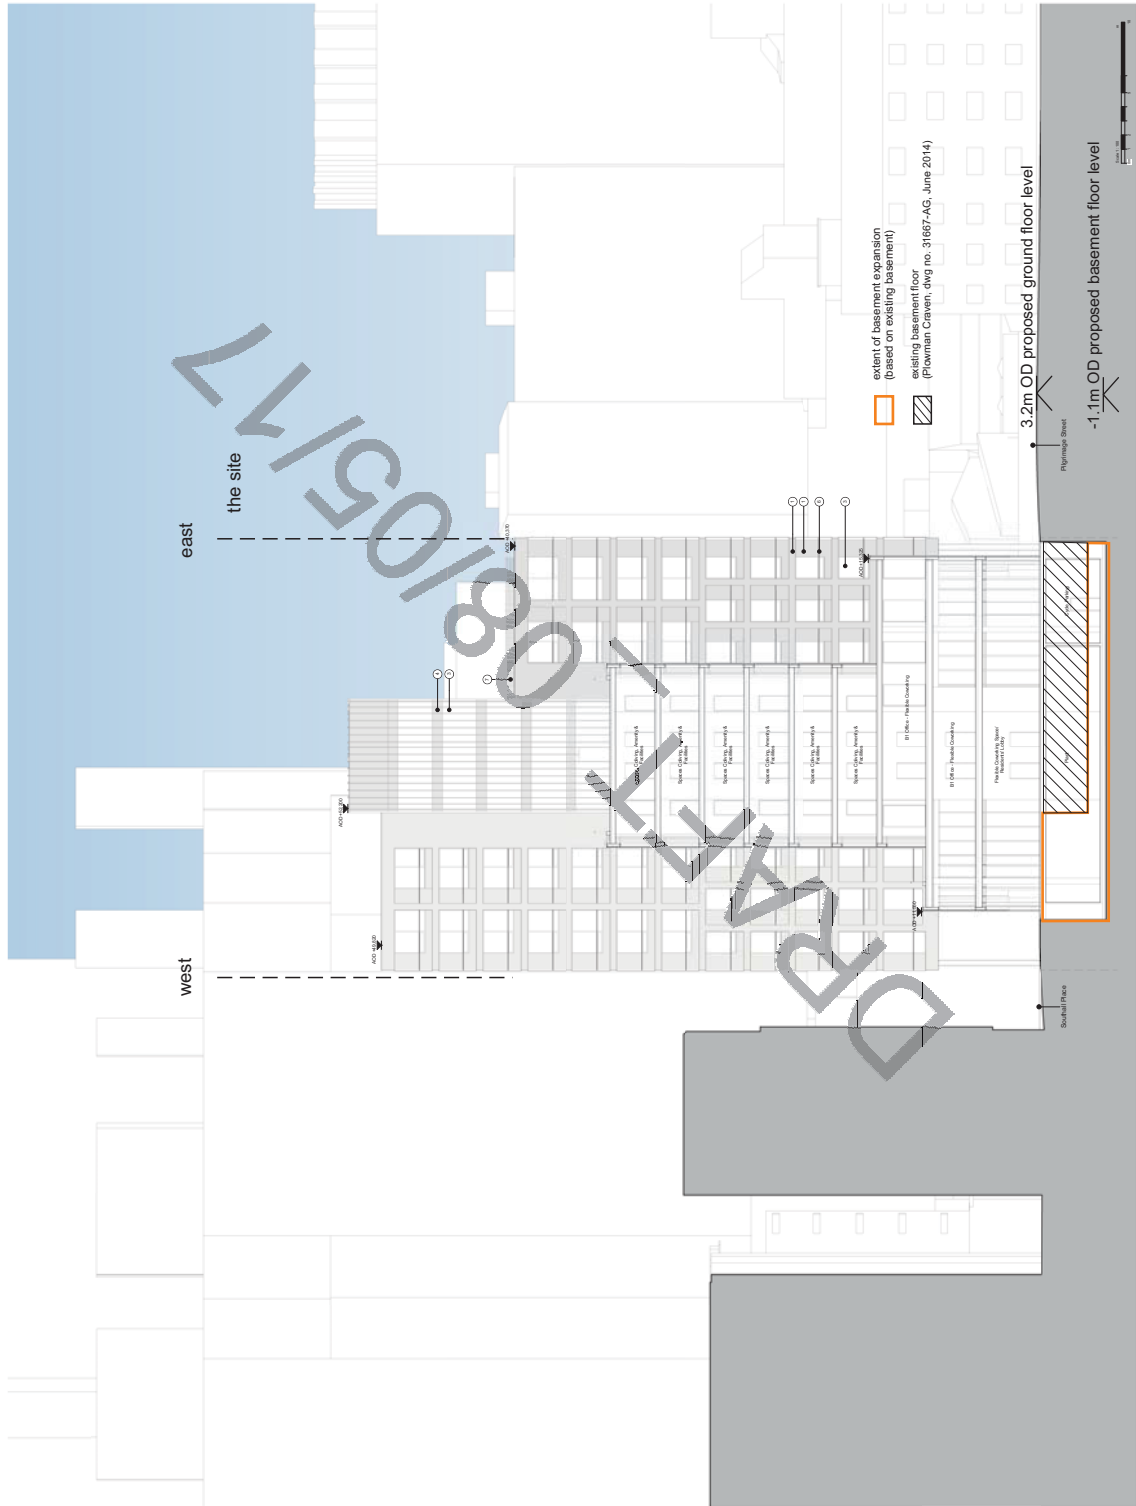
Proposed south-facing section showing basement floor (make architects, 1329, dwg no. P2252, dated 14/02/2017)
